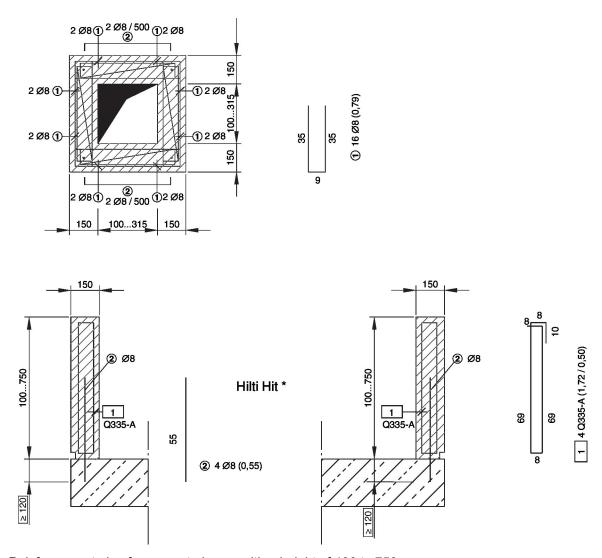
Reinforcement plan for concrete bases with a height of 100 to 750 mm
